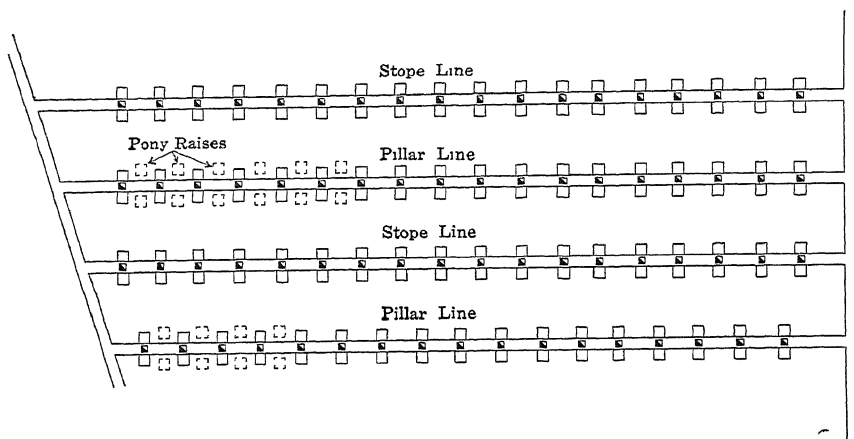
PLAN OF DRAWING-OFF LEVEL SHOWING CHUTE ARRANGEMENT. PILLAR CHUTES OF TWO TYPES.
